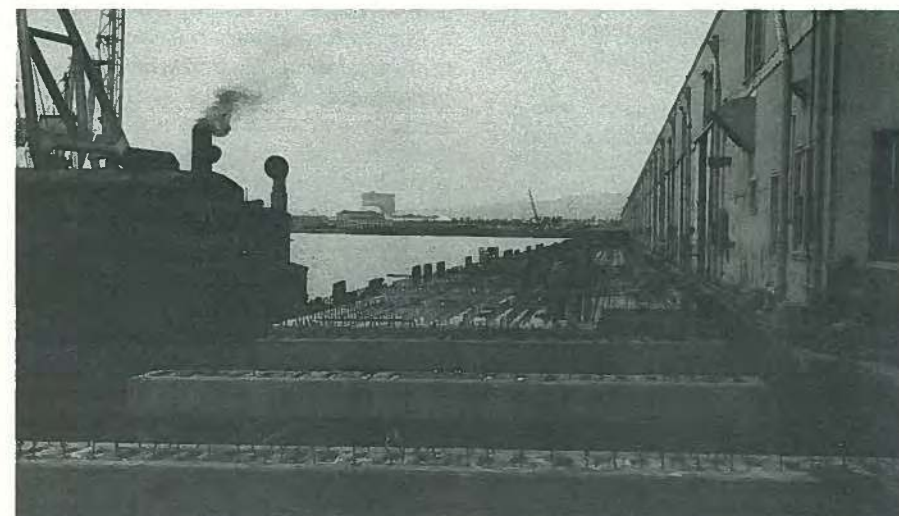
All prestressed marginal wharf for railroad loading: pretensioned concrete piles, precast pretensioned cap girder, and precast pretensioned deck slabs to be part of lower portion of deck make up the structure. Cast-in-place concrete in upper part of deck ties together all the components of the wharf.
